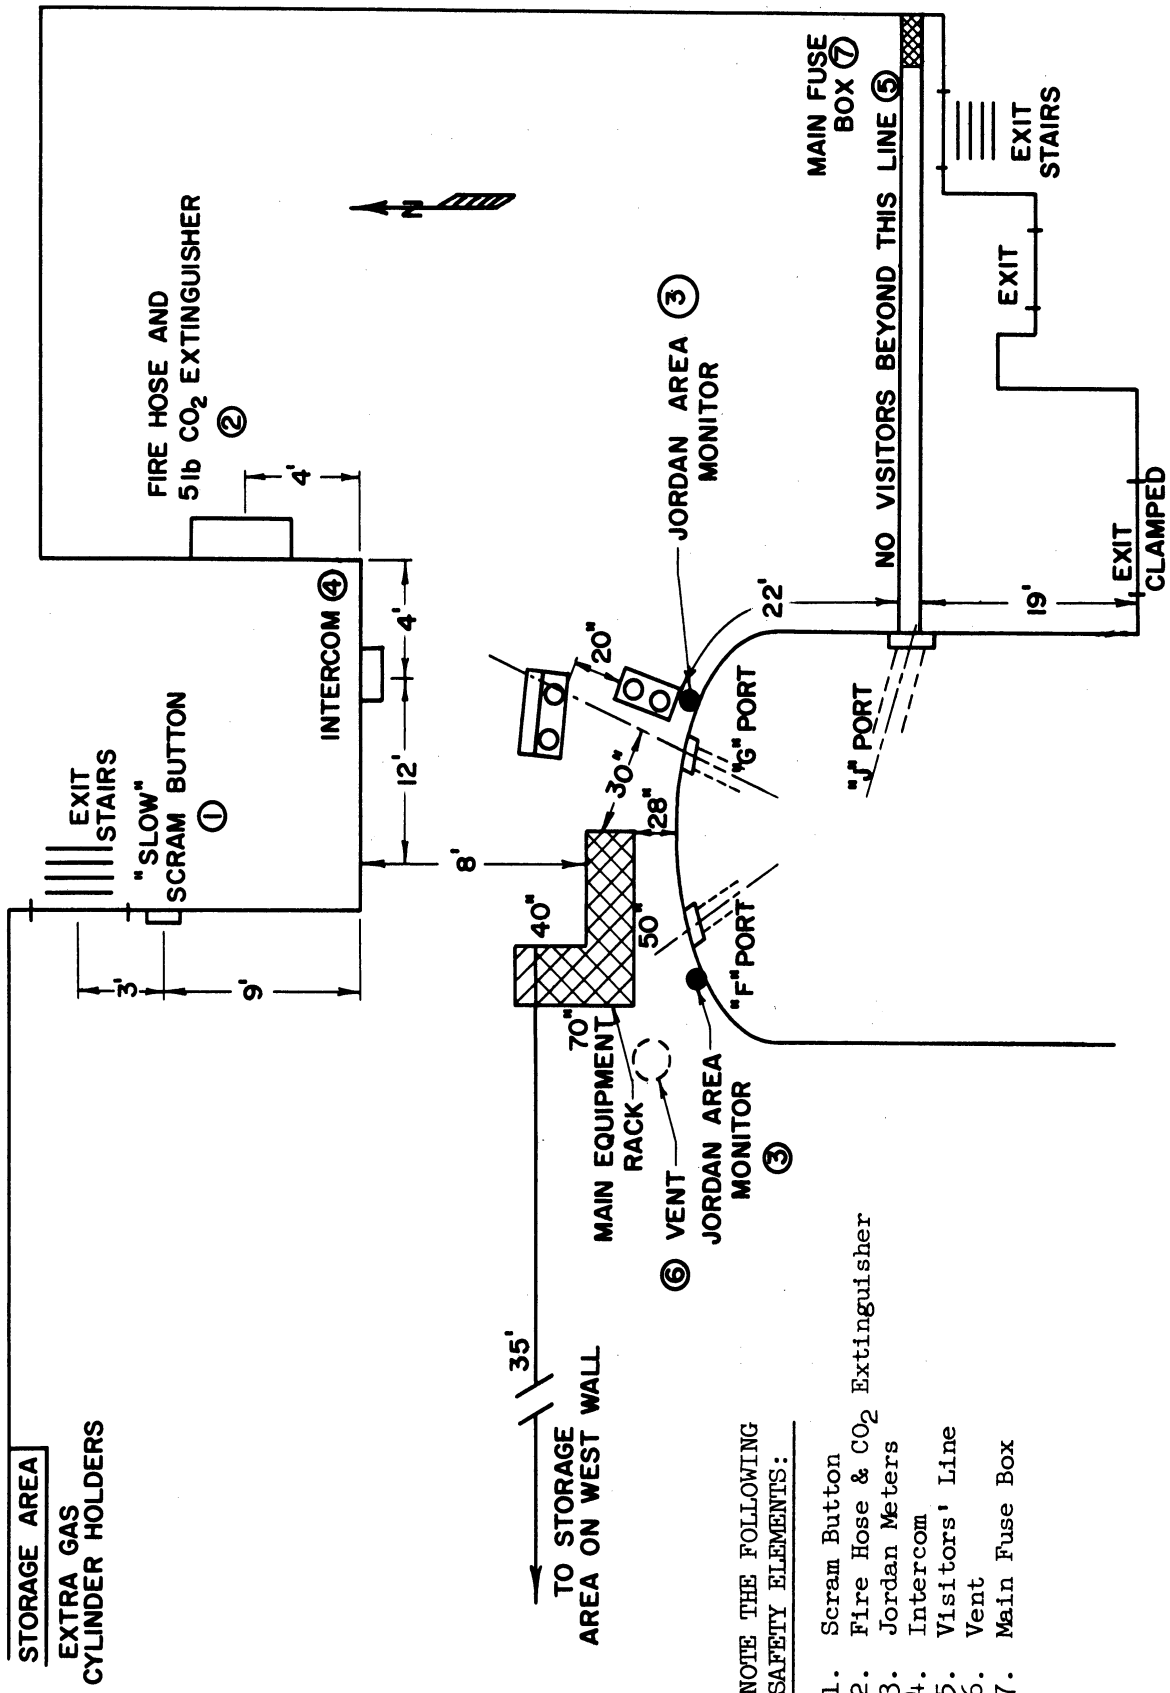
General Floor Plan and Apparatus Location for the Beam-Port Floor
